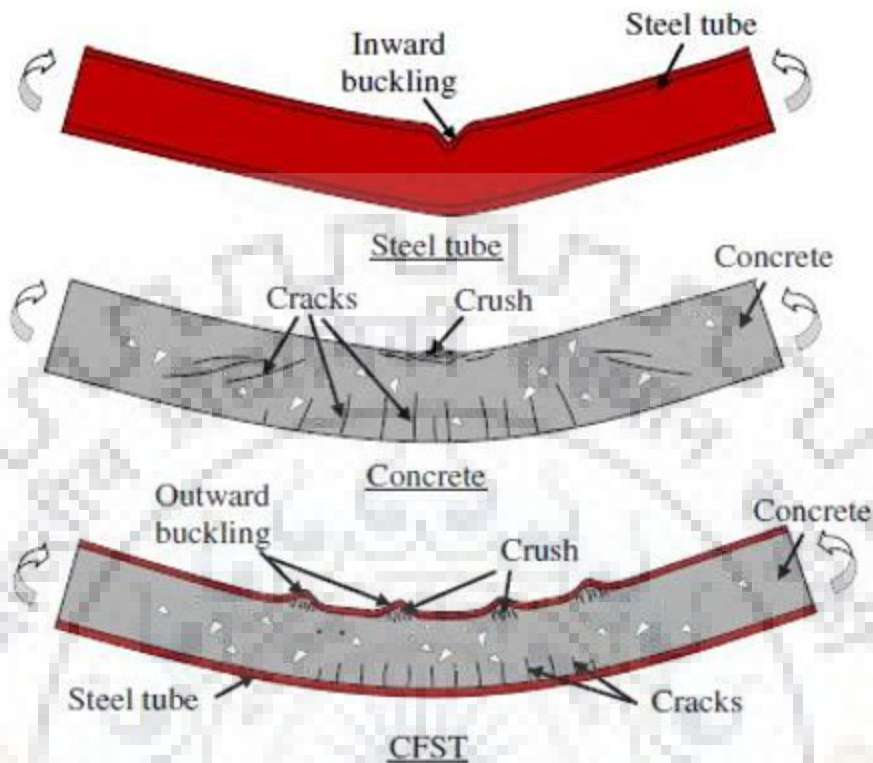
Failure of CFST beam and corresponding Steel Tube and Concrete
